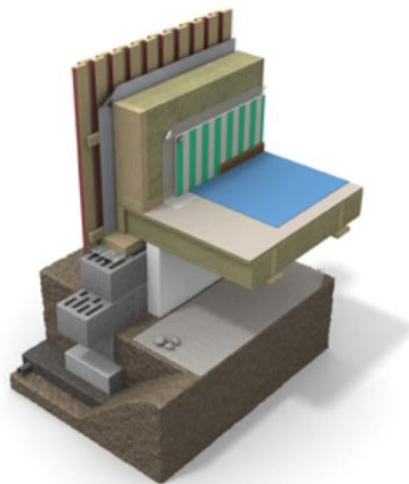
Ventilated Timber Floors (Paroc, 2021).
